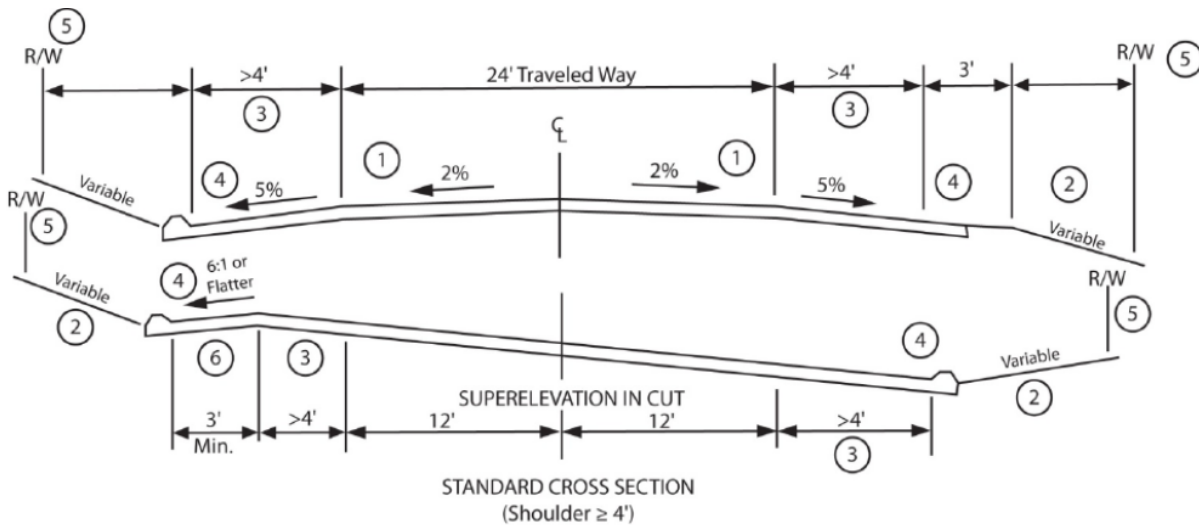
Geometric Cross-Section for Two-lane roadways (New Construction). (Sarasua et al., 2018)
